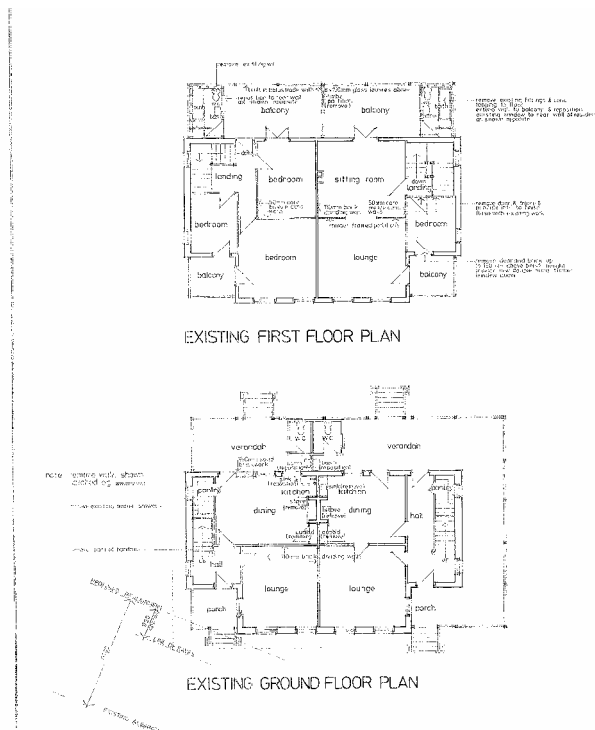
Extract from 1979 Department of Works alterations proposal plan C 64-581-1
